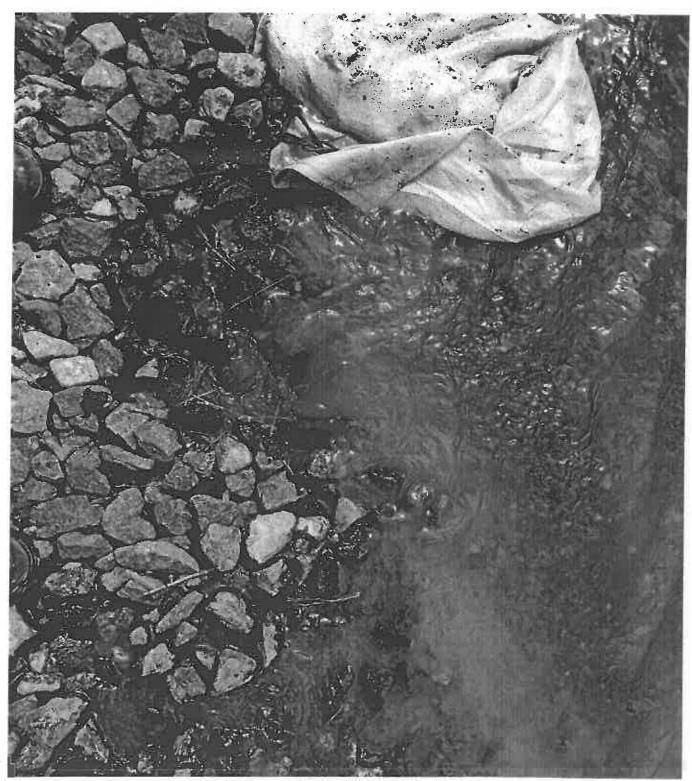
Sediment laden runoff from site to stormdrain on Cole Field Drive in photo 1 off the site.
